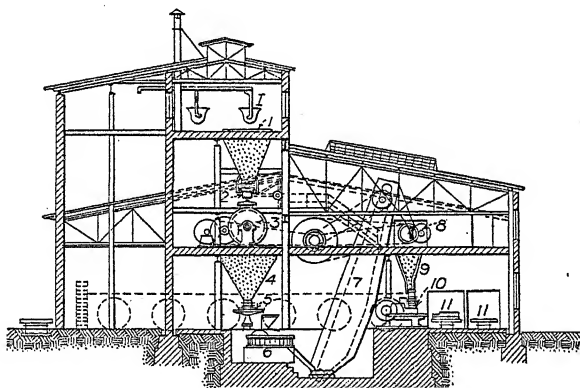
CROSS-SECTION OF BRIQUETTING PLANT.
